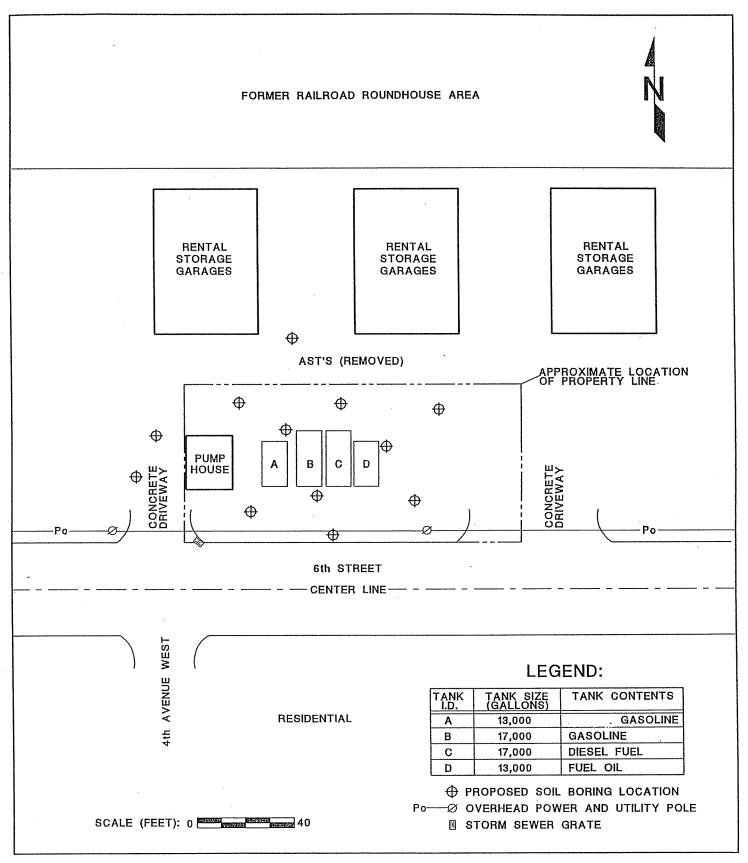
PROPOSED BORING LOCATION MAP 6th STREET BULK PLANT ASHLAND, WISCONSIN
